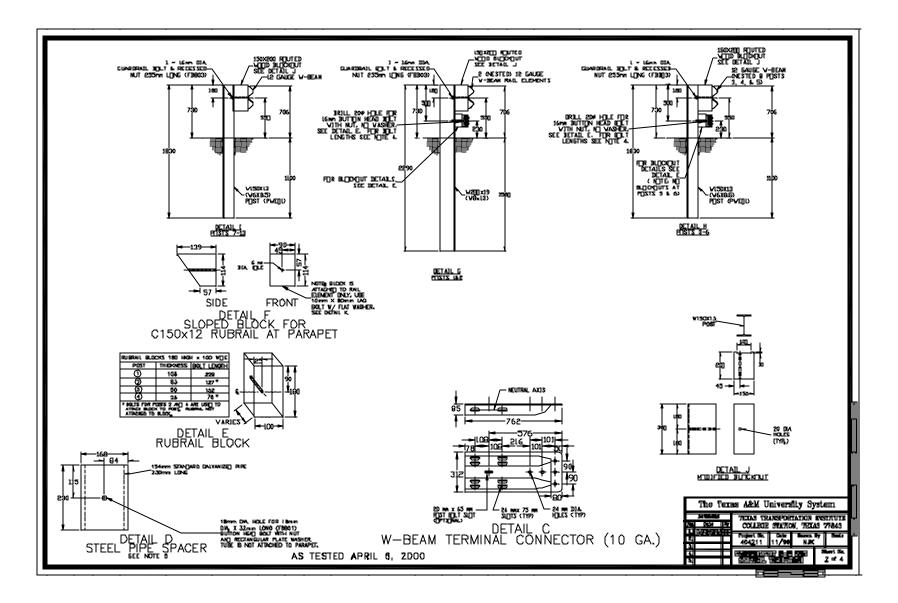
Details of the Connecticut transition installation for test 404211-9 (continued).
